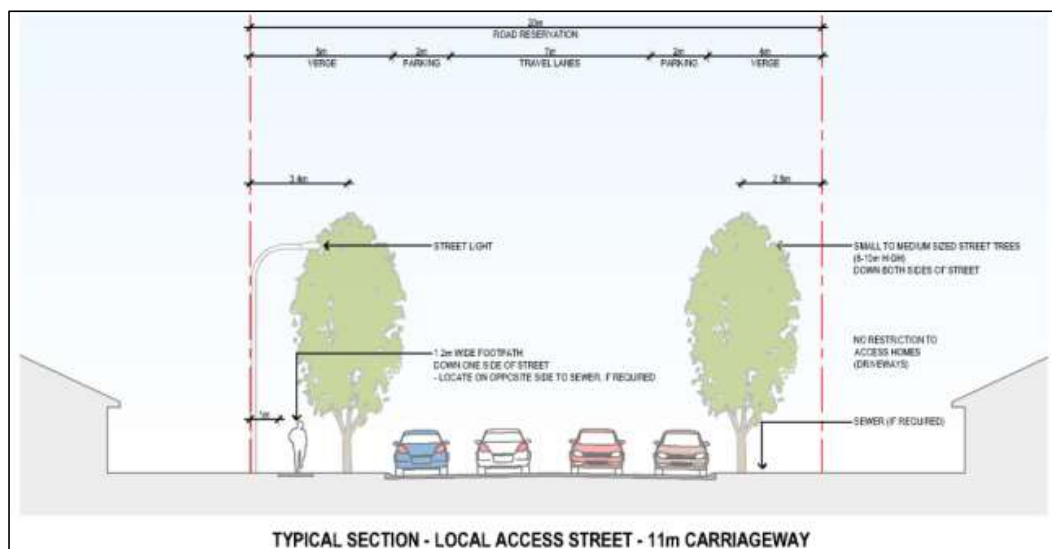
Typical Street Sections – Local Access Street (11m carriageway)
